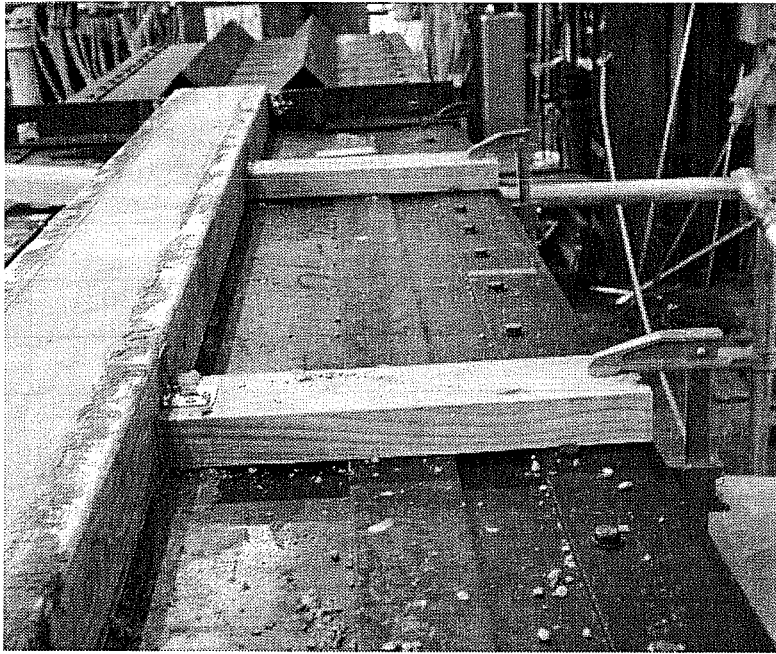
Concrete Reinforcing Cage and Shear Studs
